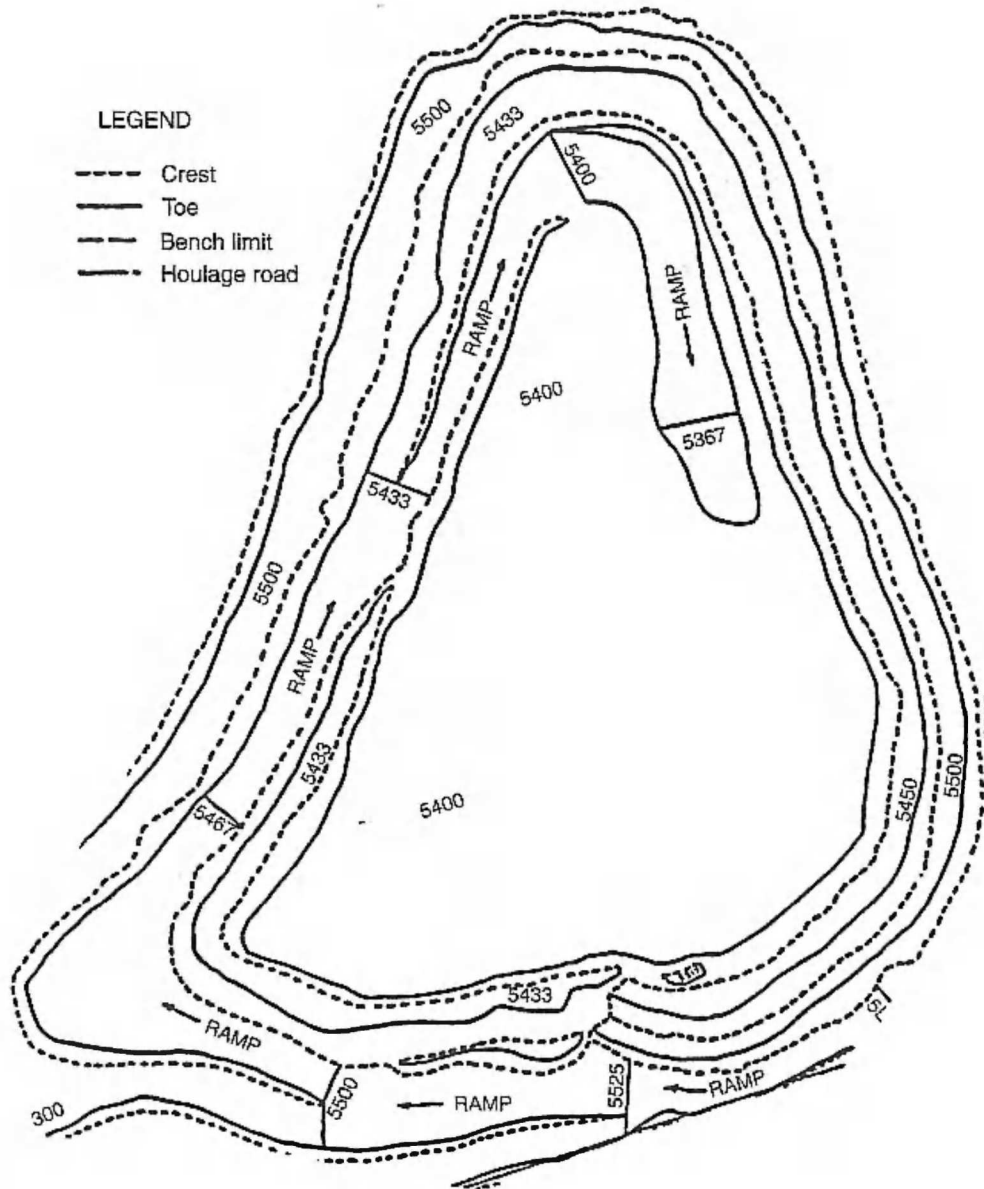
Extension of the current ramp close to the pit wall (McWilliams, 1959).
